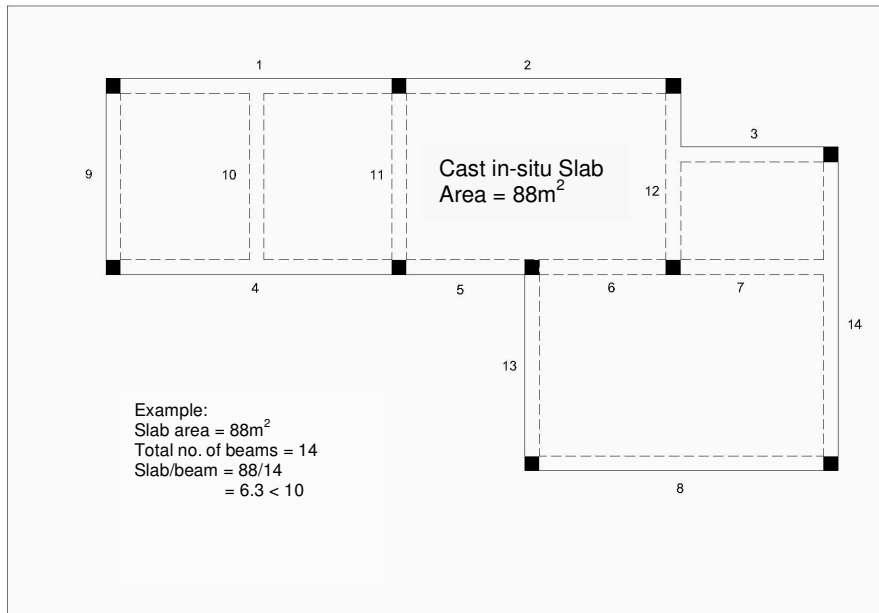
Slab/beam and LSI for cast in-situ beam/column with precast and cast in-situ slab systems
